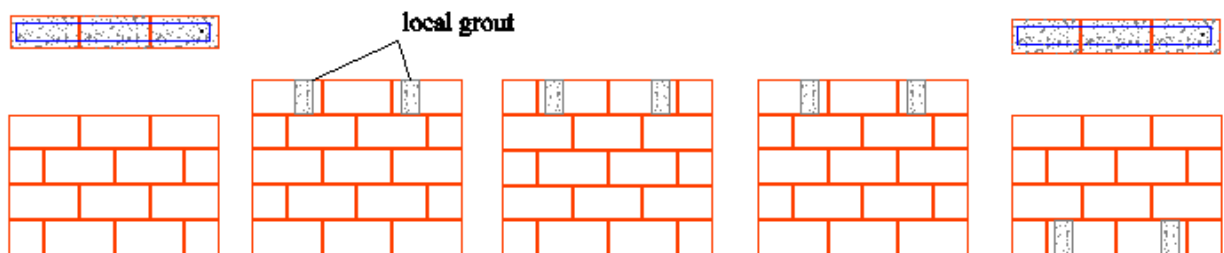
Construction process 1 – end beam and small walls built by laying blocks vertically
